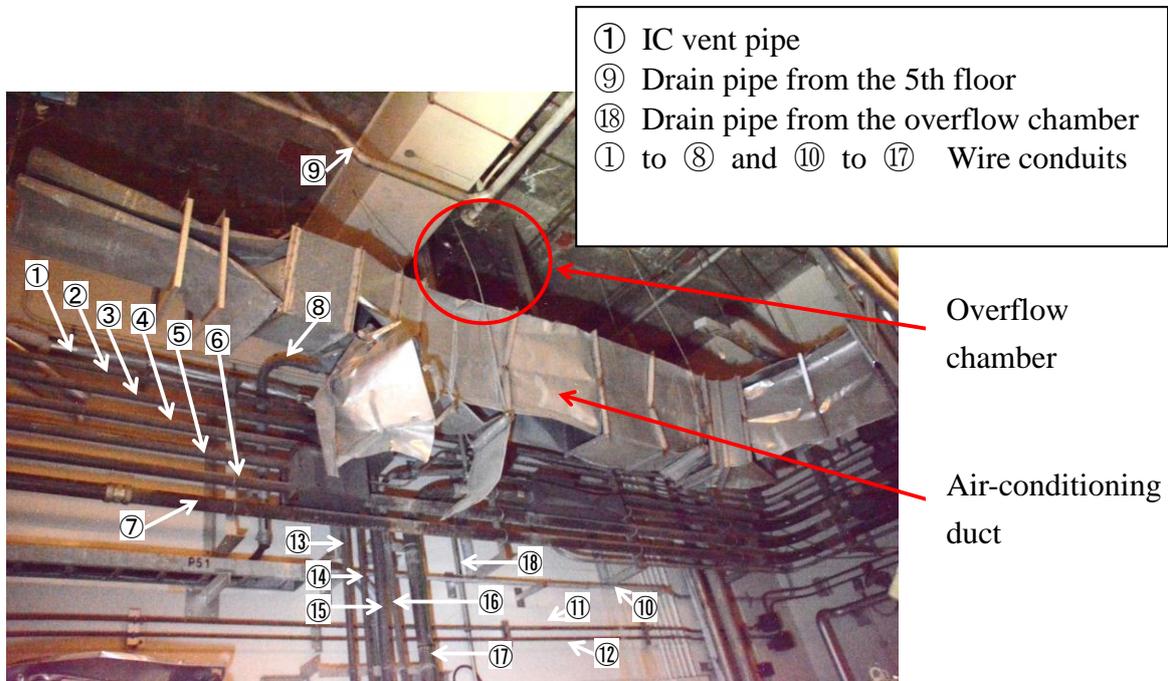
Pipe Layout near a Location where Water was seen coming out
